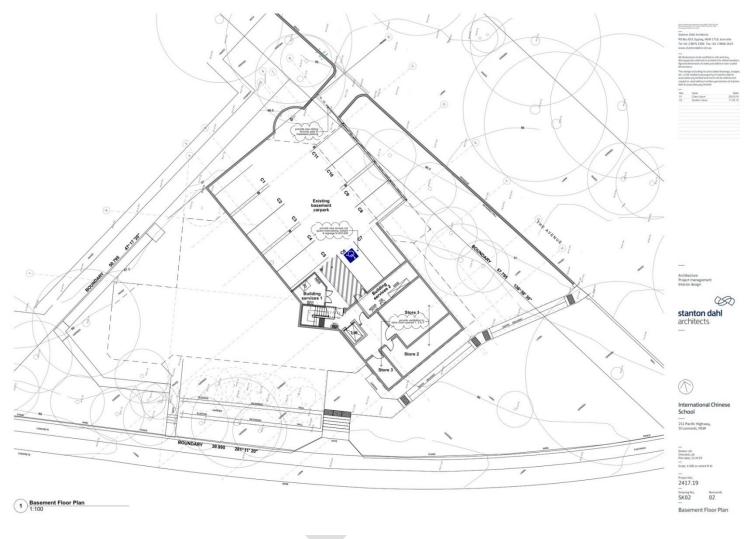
International Chinese School, Basement Floor Plan. Source: Stanton Dahl Architects, Drawing SK02, 11/4/2019.
